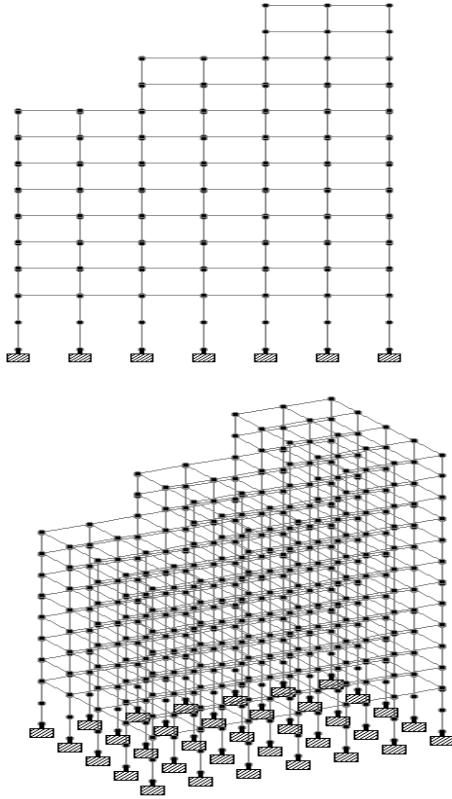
Elevation of the Structure (a) X view (b) isometric view
